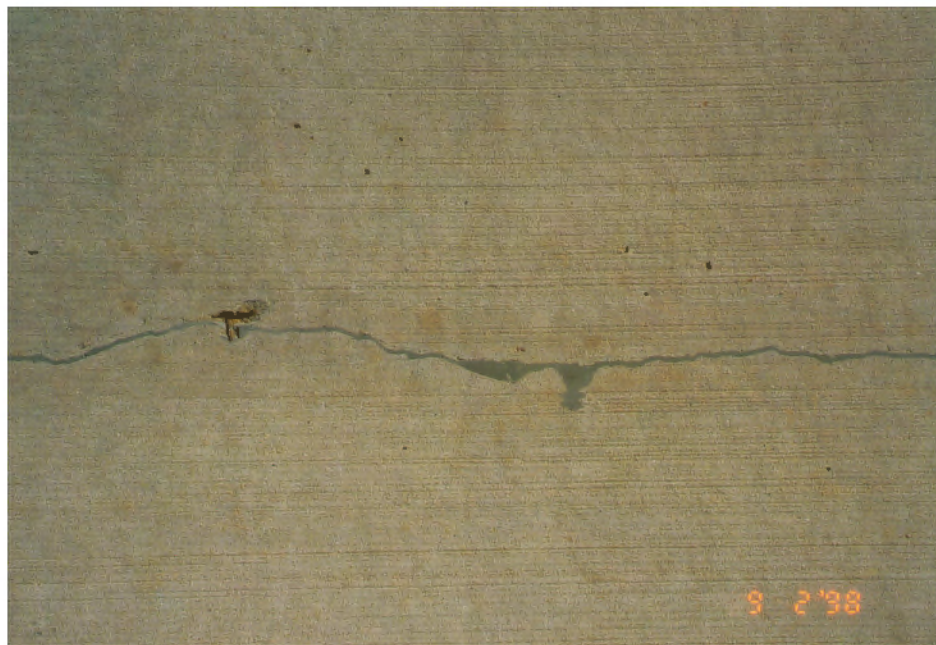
PAVING CRACK NO. 2 IN PRESTRESSED PAVEMENT
